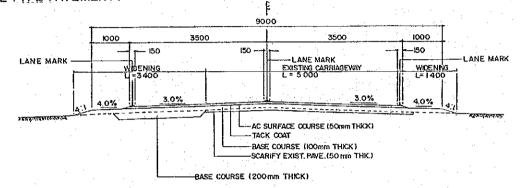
TYPICAL CROSS-SECTIONS (1/4) -66-
